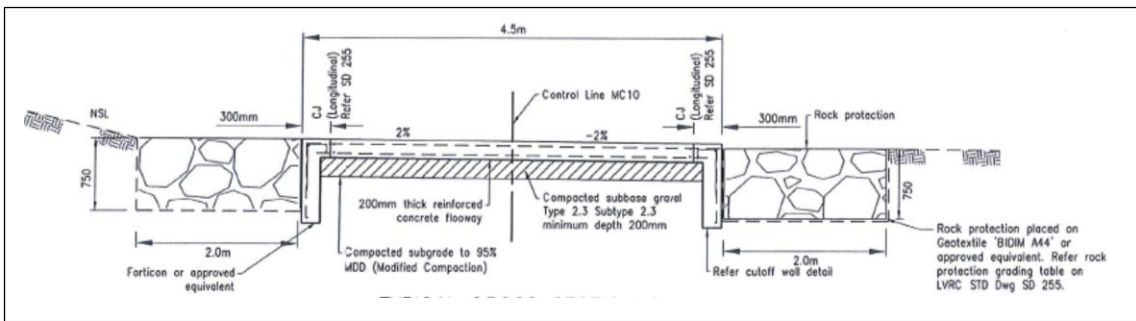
TYPICAL CROSS-SECTION FOR SECTION C [18]
